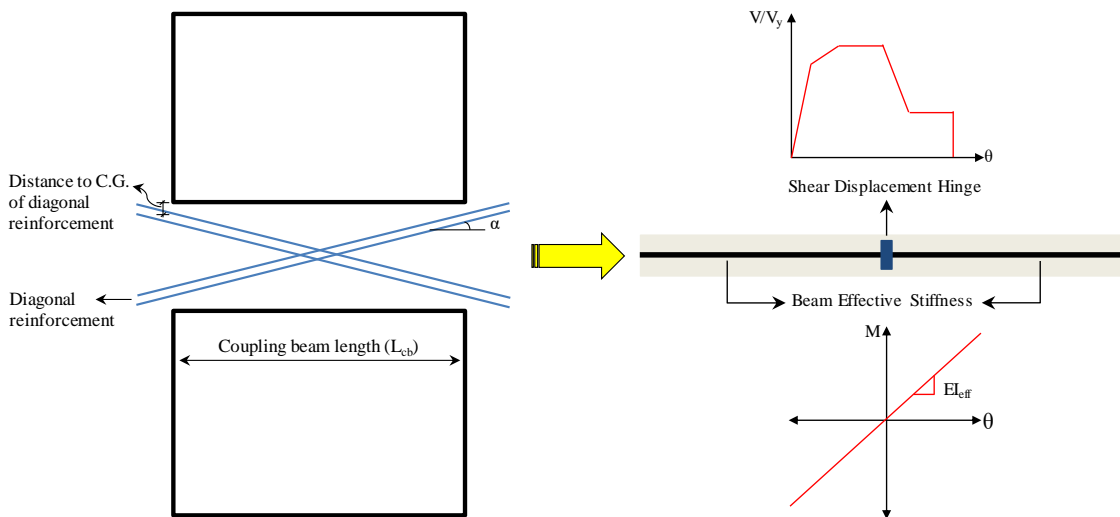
Typical coupling beam modelling in PERFORM-3D
